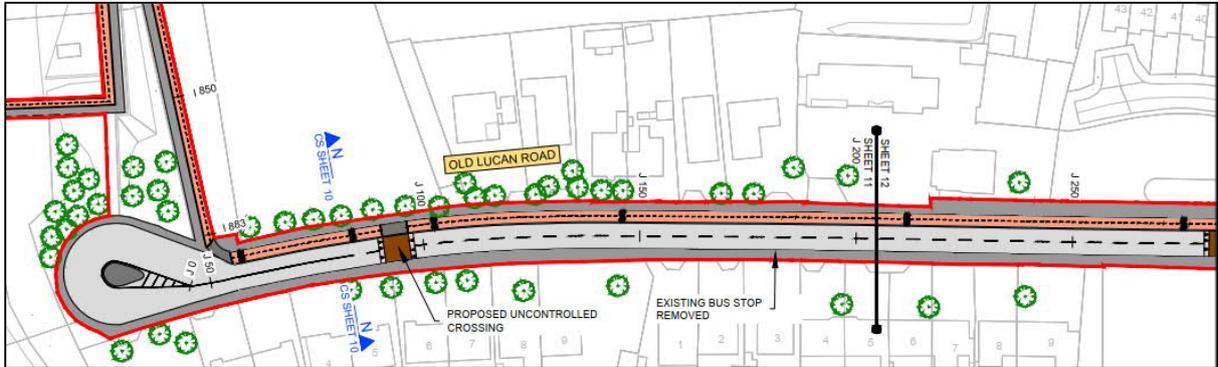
Proposed Design - Old Lucan Road east of the M50
